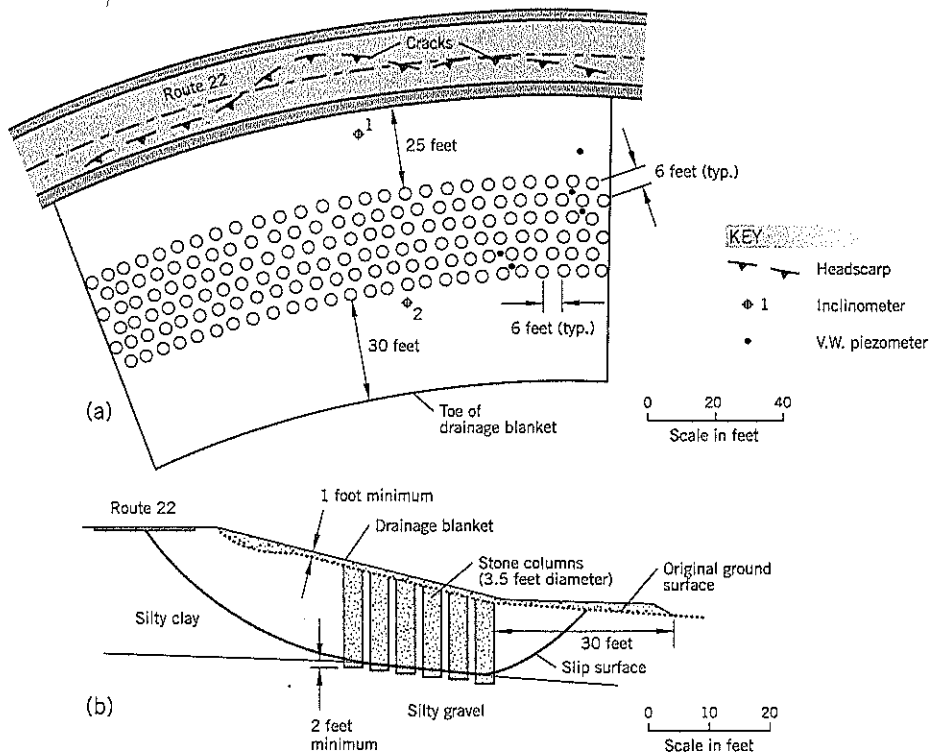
Stone column remediation of a landslide at Wadhams, New York State:
